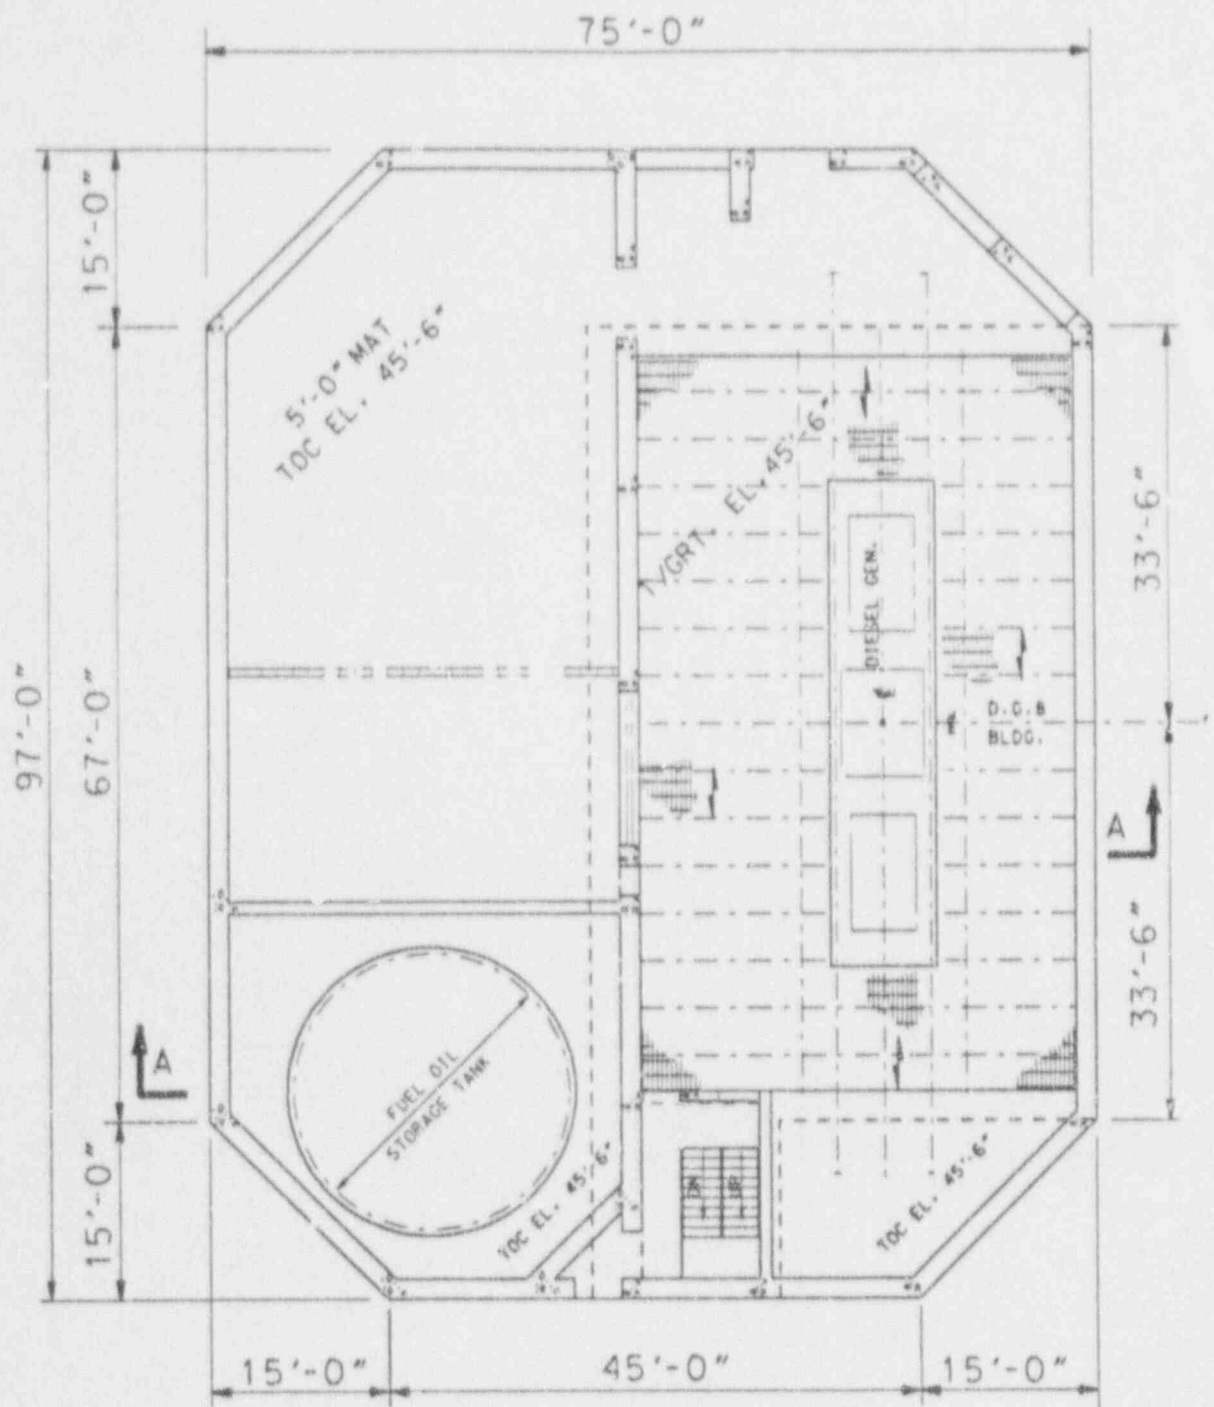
PLAN VIEW - EL. 45'- 6"
